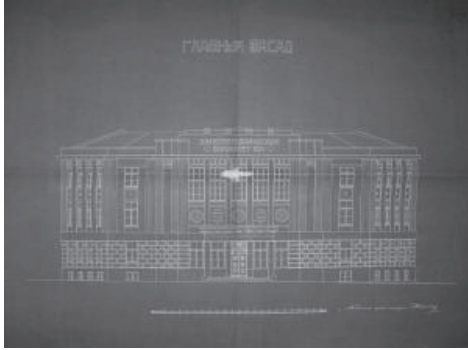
Project of the Electrotechnical Building, 1928 [№ 1, c. 2]
